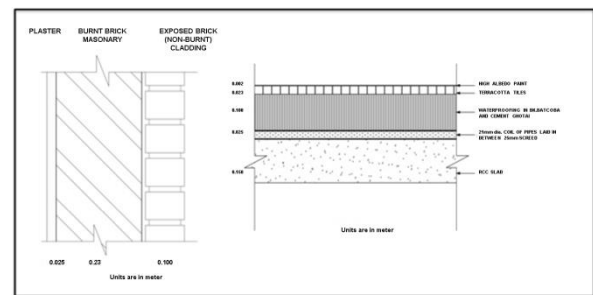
a. Cross section of Wall and b. Roof for calculation of Thermal Transmittance
